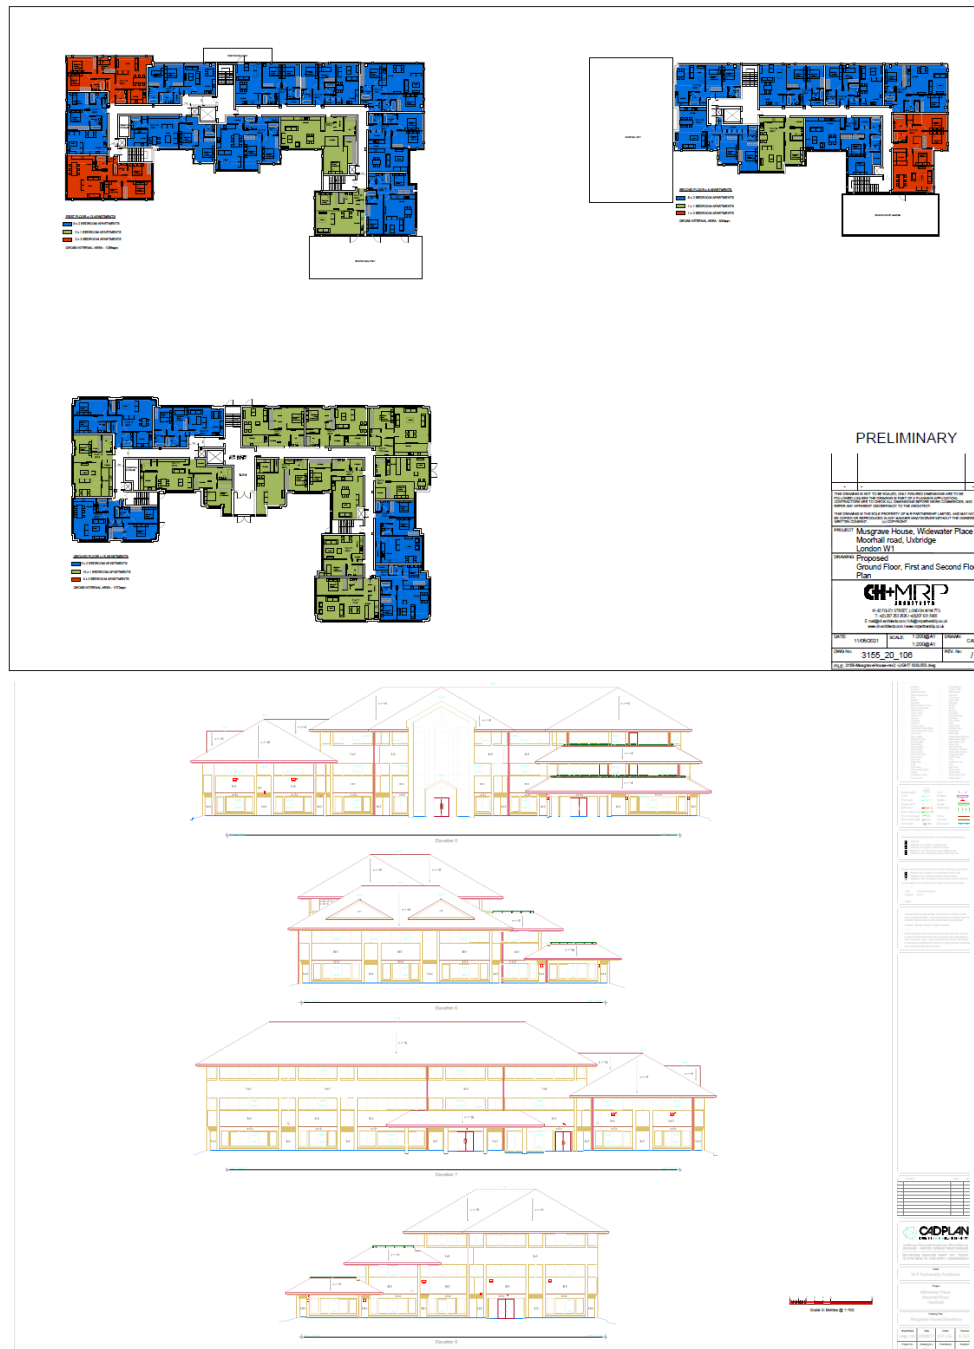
Plan drawings of the scheme (top) and elevations of the scheme (bottom)
